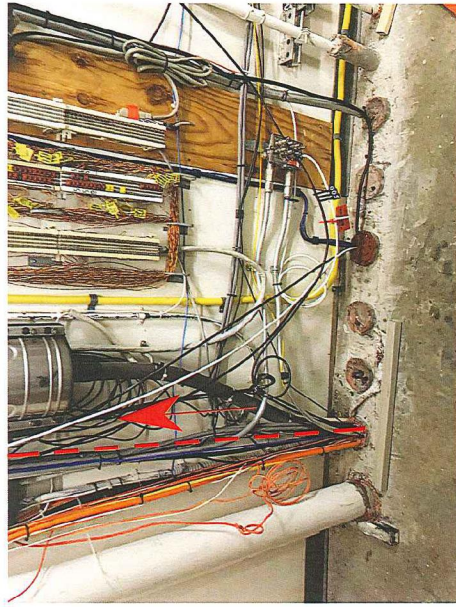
PHOTO: AT THE FOURTH FLOOR ELECTRICAL/TELEPHONE ROOM TO THE FIFTH FLOOR
